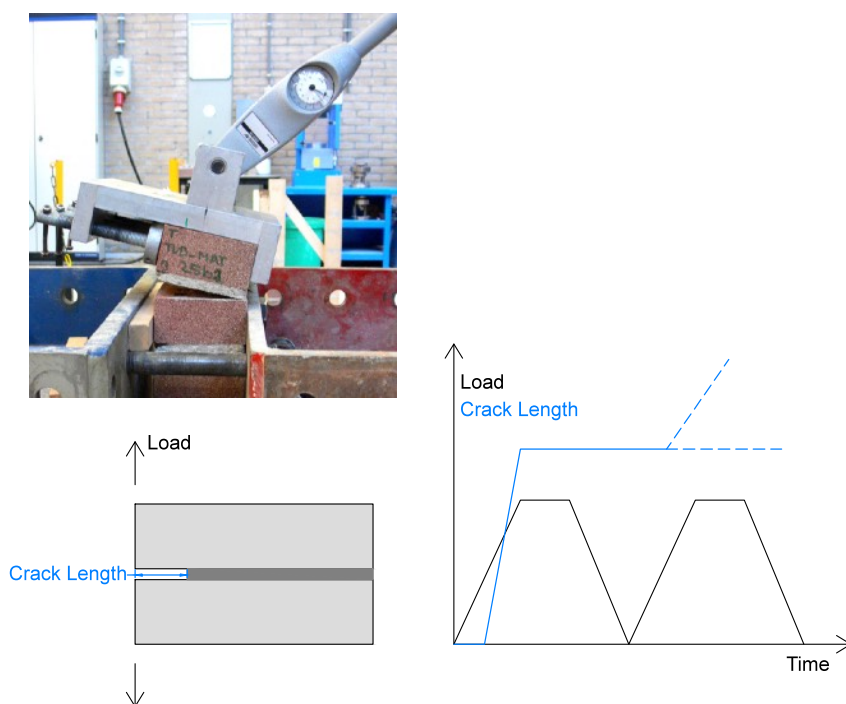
Behaviour possibilities for illustrative crack propagation when subjected to a load repetition of equal intensity. Top: photo of a bond-wrench test on a masonry couplet.
